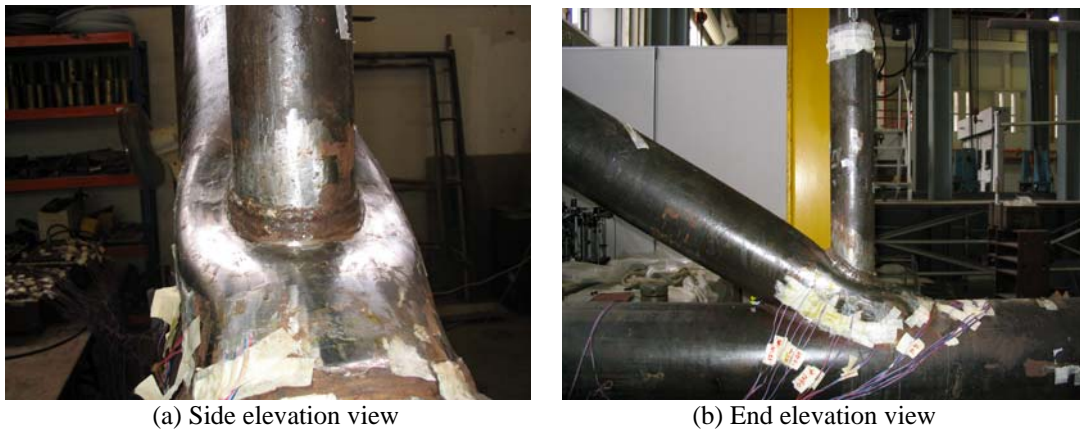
Failure mode of joint specimen under monotonic loading
